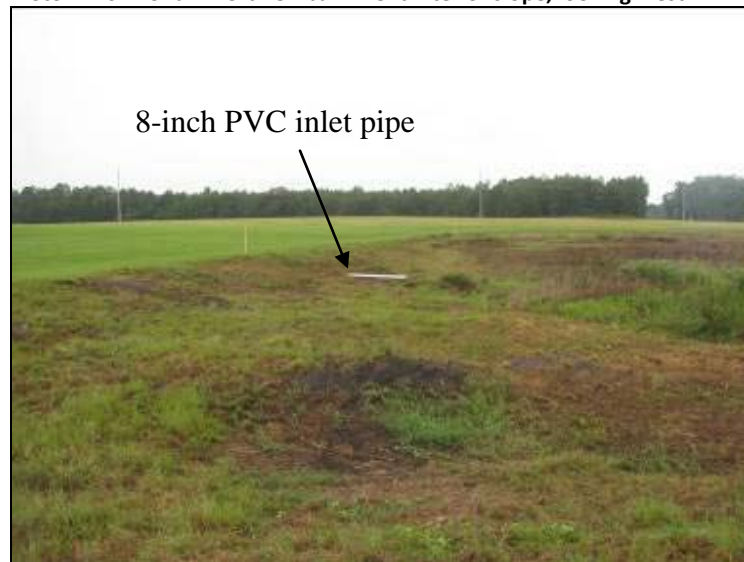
Ash Pond – Southeast embankment interior slope and pond surface area, looking south.
